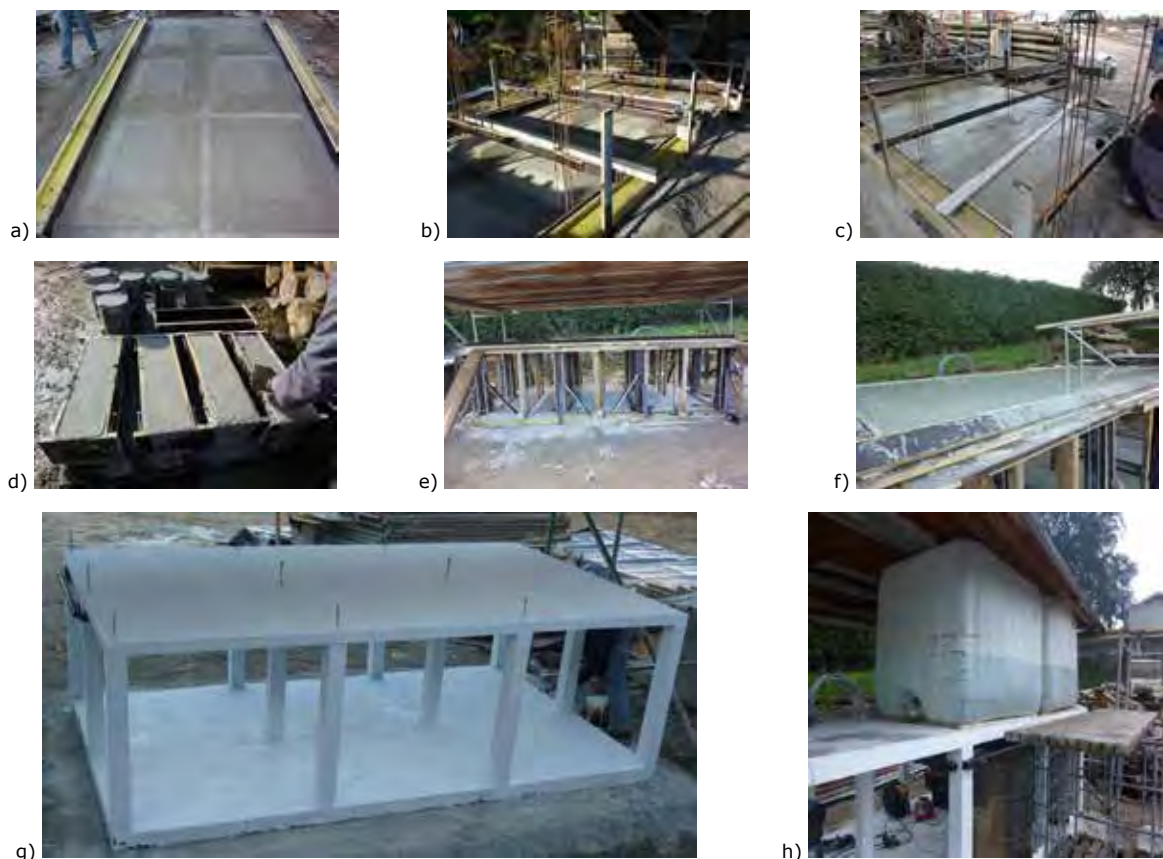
The construction suspended slab prototype: (a) preparation of the foundation for the slab on grade; b) Reinforcement of the columns; c) casting the slab on grade (1st batch); d) casting the SFRSCC specimens; e) casting the columns (2nd batch); f) casting the elevated slab; g) general view of the prototype after has construction; h) Water tanks loading corresponding to the serviceability limit states
